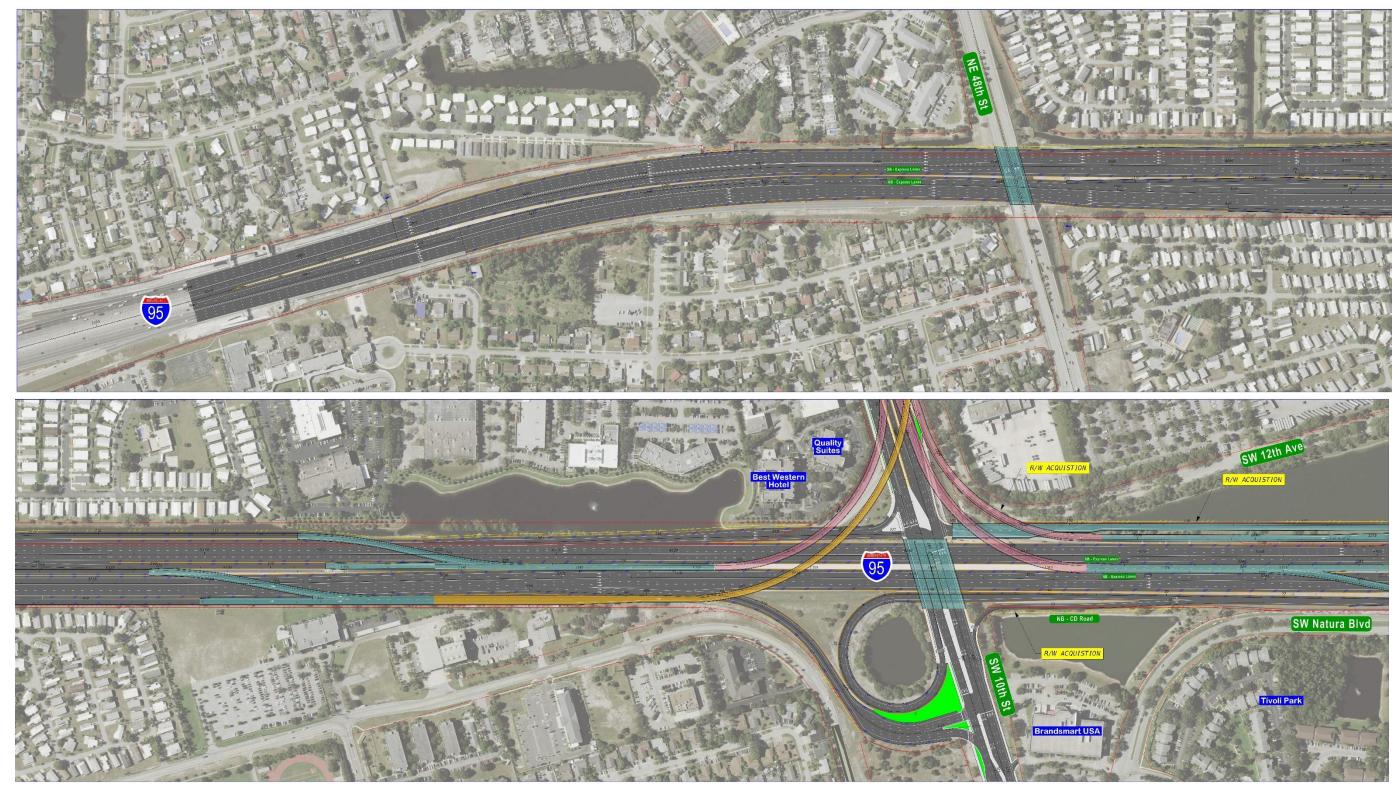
2: Alternative 2 Concept Plan (South of SW 10th Street)
